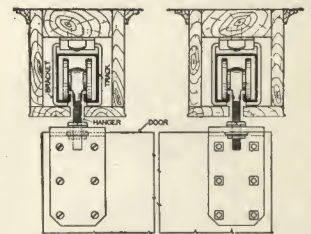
Cross-Section view of Single Tracks. (See "B" in plan of Doors below).
